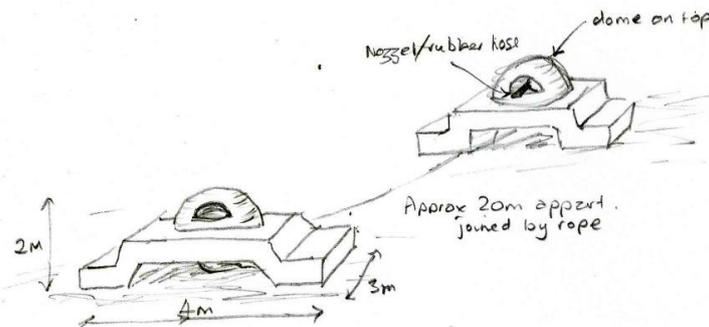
Concrete 'Bumps' believed to be part of a disused outflow pipe system.
